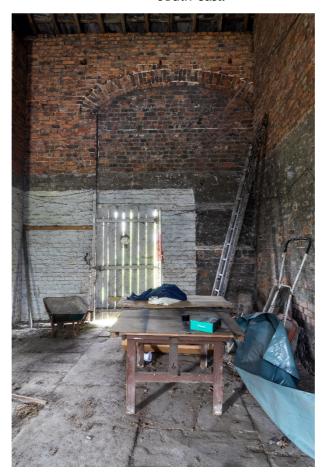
internal aspect of barn door set within north-east wall, facing north-east.
